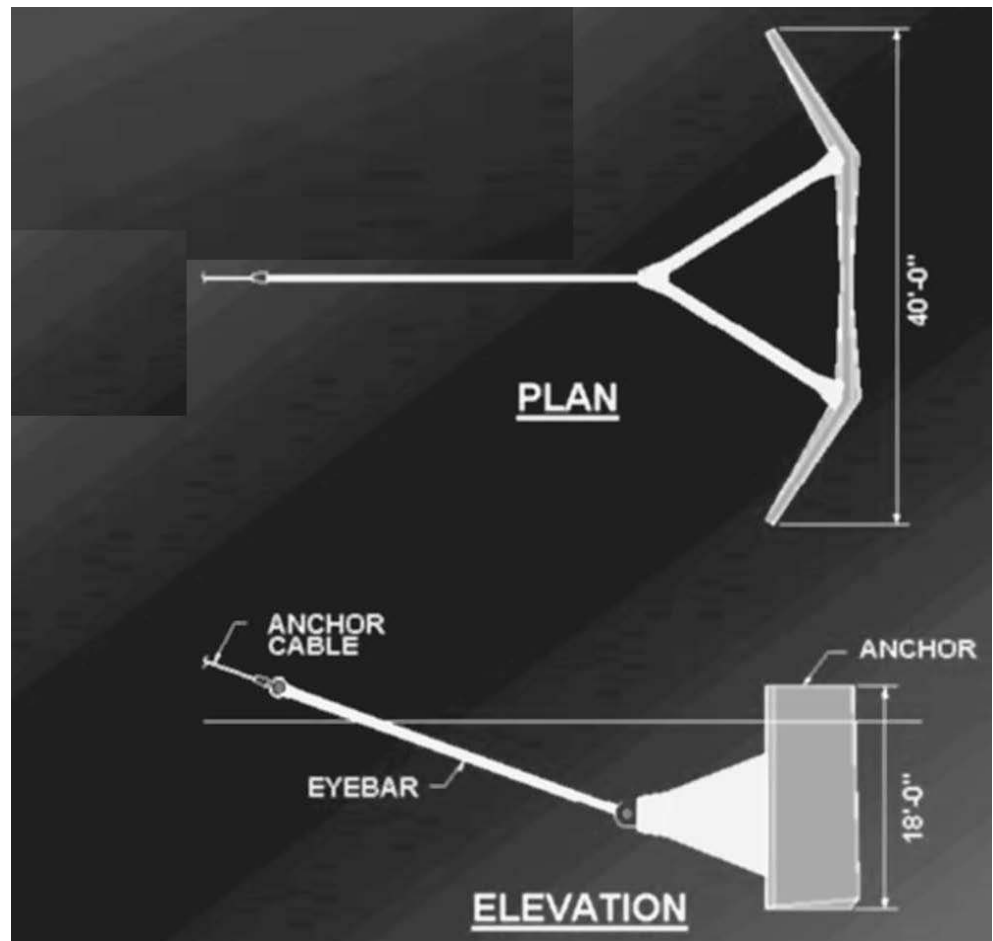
Precast Concrete Fluke Style Anchor
